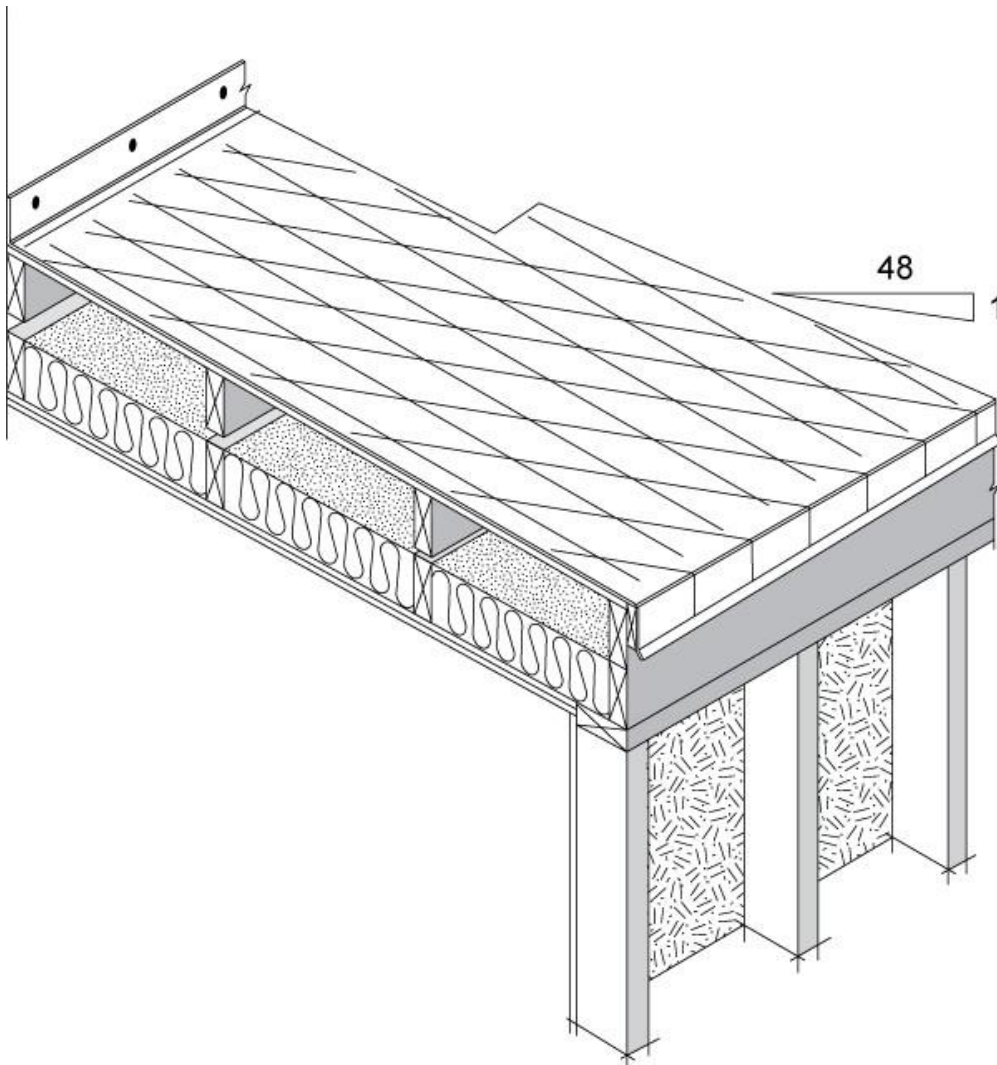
Typical roof/deck application for “DekSmart™ Ultra”
